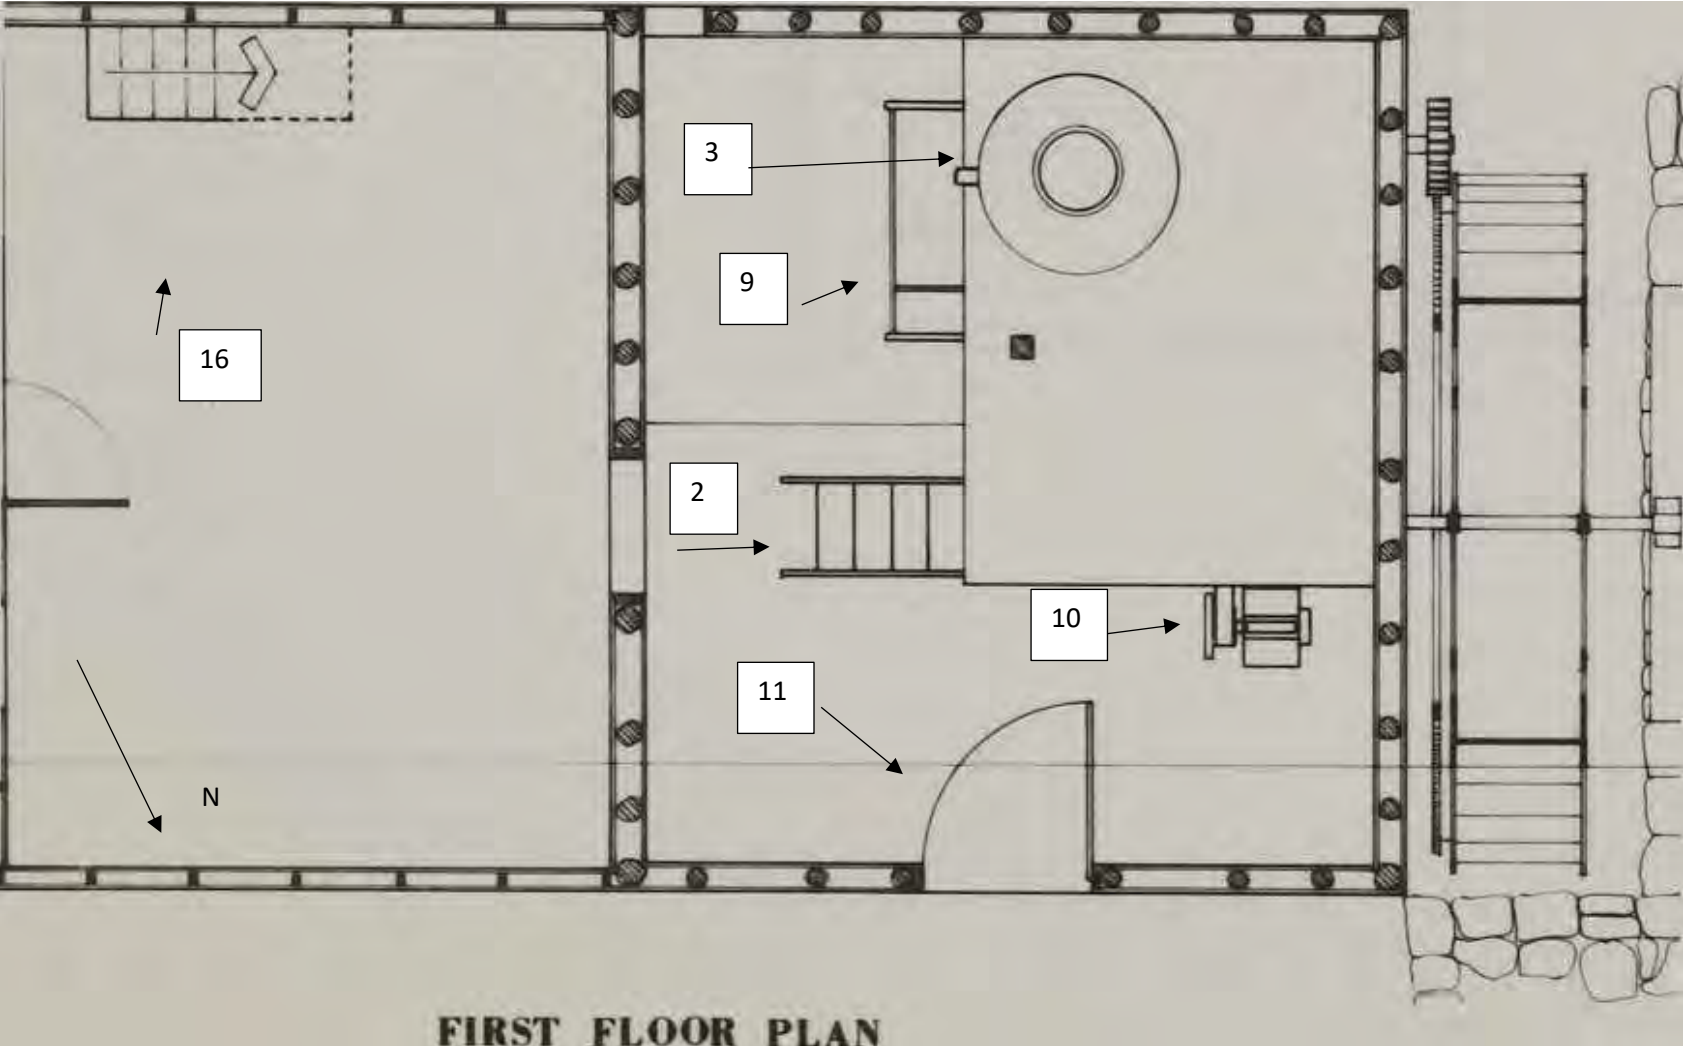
of-04, First Floor Plan A.J. Long Mill Greene County, VA DHR # 039-5005
